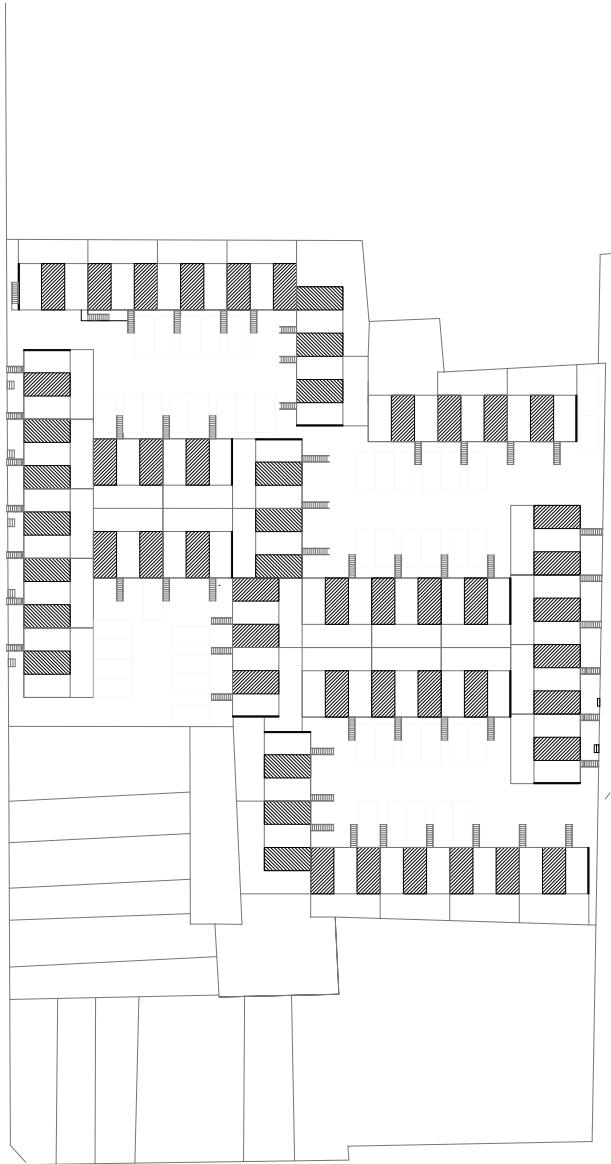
Site plan [ELEMENTAL, n.d.]
